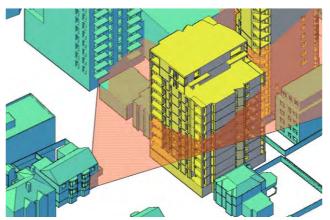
35-36 Ethelbert Close 25-degree plane.
